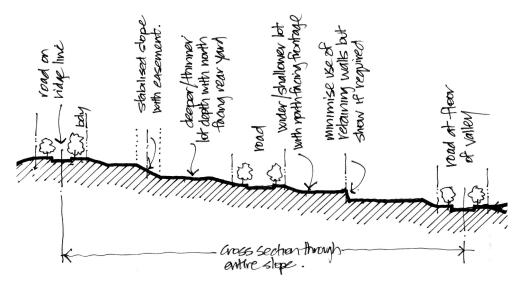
Cross Section from ridge to floor of valley showing proposed roads and earthworks at boundaries.
